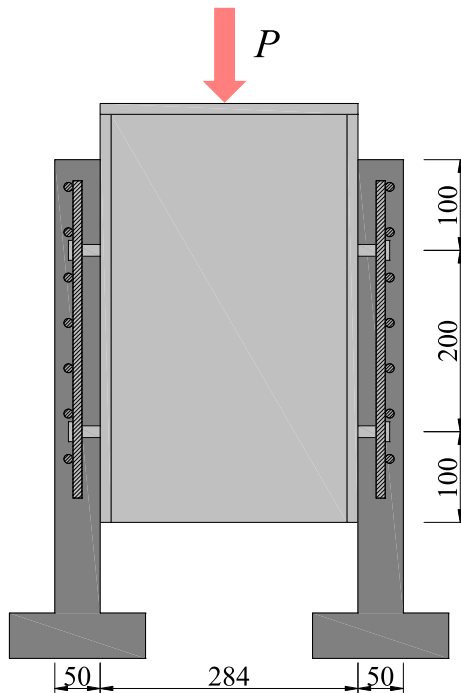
Specimen details of the push-out test (unit: mm) [7].
